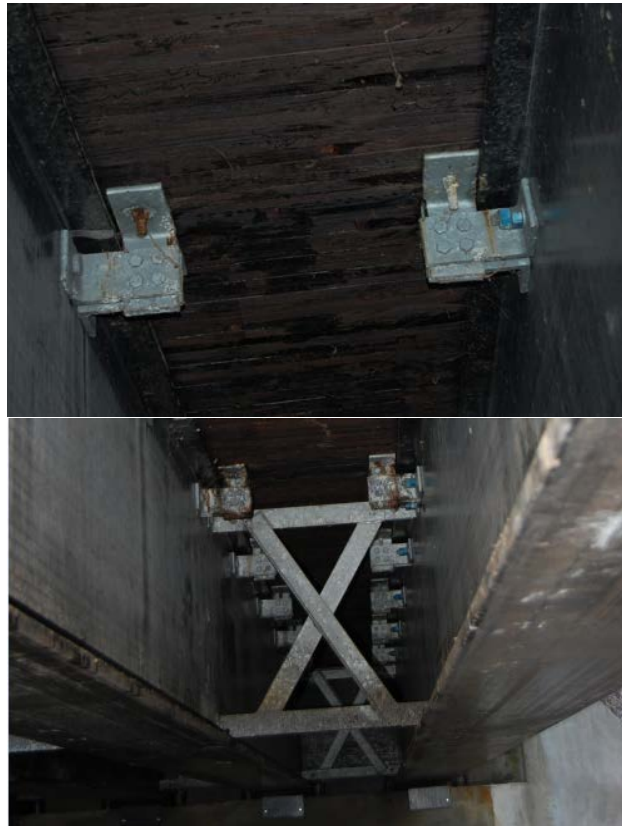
Photos of Dickey Creek bridge, Route 601, Sugar Grove, VA. (A) Deck connectors for pultruded FRP bridge girders. (B) Galvanized steel cross-bracing. Photos courtesy of Dr. Brandon Ross, Clemson University.
